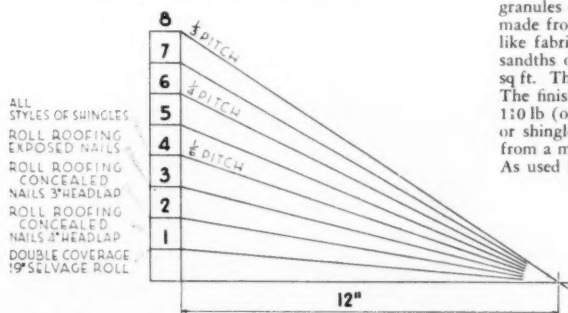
Minimum-pitch requirements for asphalt roofings as recommended by the Engineering Committee of the Asphalt Roofing Industry Bureau
